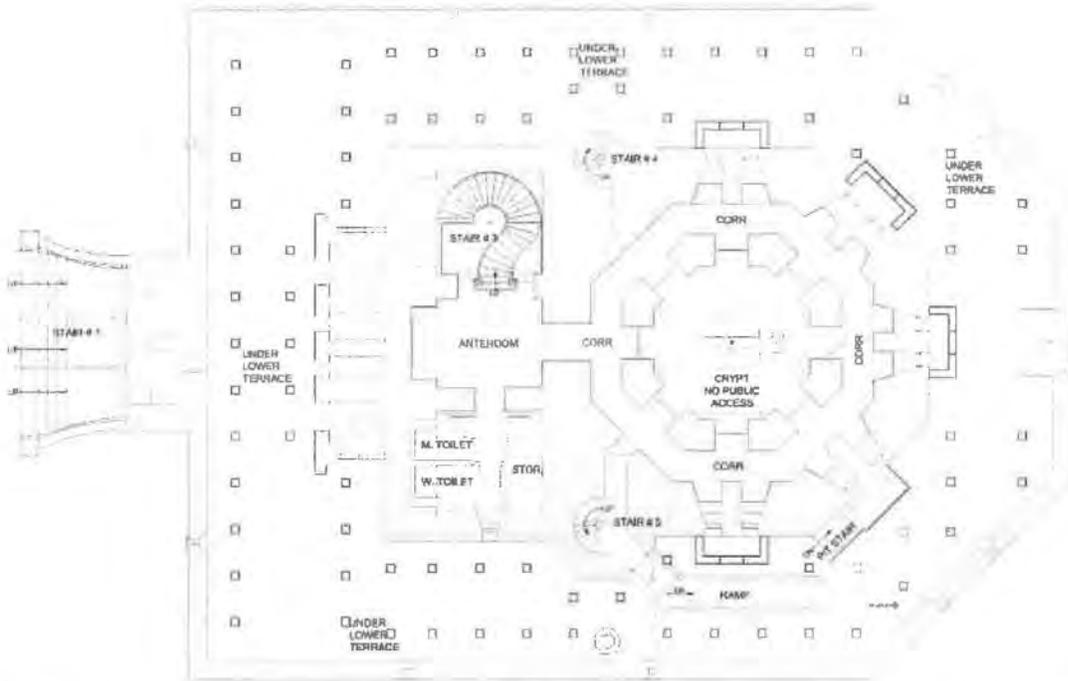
Crypt level floor plan. Source: Westlake, Reed, Leskosky architectural plans.
